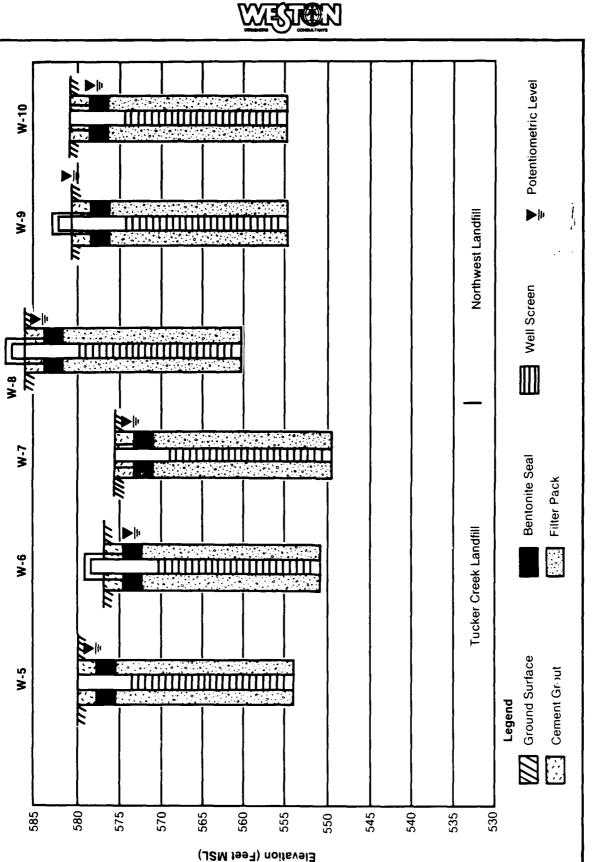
WELL CONSTRUCTION SUMMARY, TUCKER CREEK LANDFILL AND NORTHWEST LANDFILL
